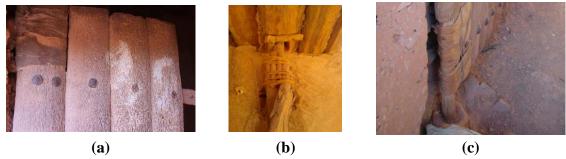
Door installation: (a) Door components; (b) Fixing in the lintel; (c) Fixing in the threshold (photos by Y. Kassou).
